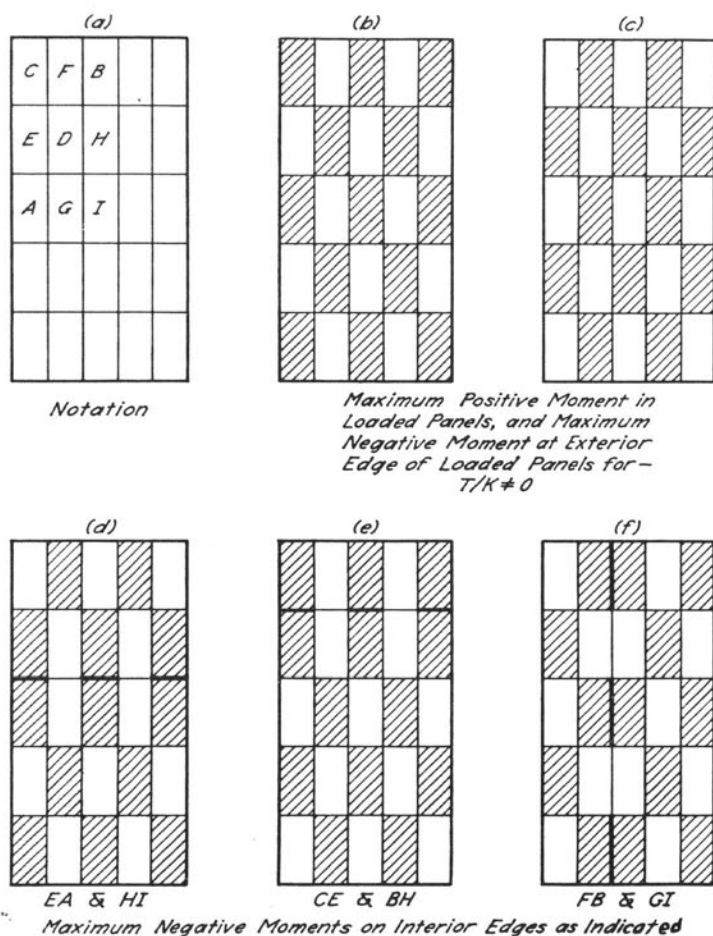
TYPICAL CHECKERBOARD LOADINGS
